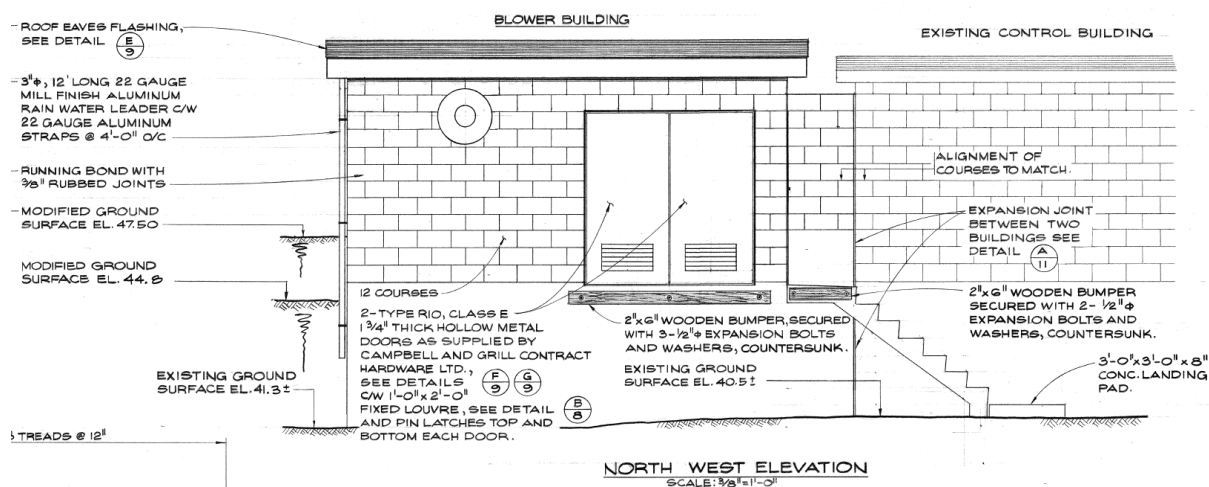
Original Blower Building Drawings Showing Key Elevations (Dayton & Knight)
